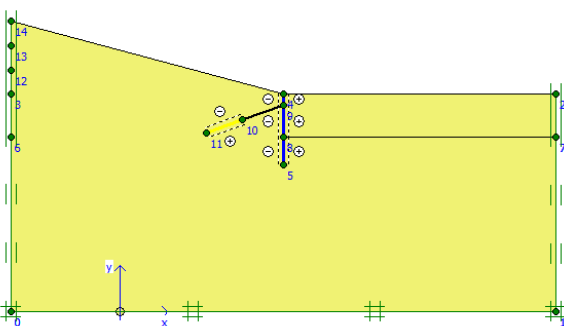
Schematic of Anchored Sheet Pile Wall and inclination of ground surface ( $\psi$ ) Analyzed
